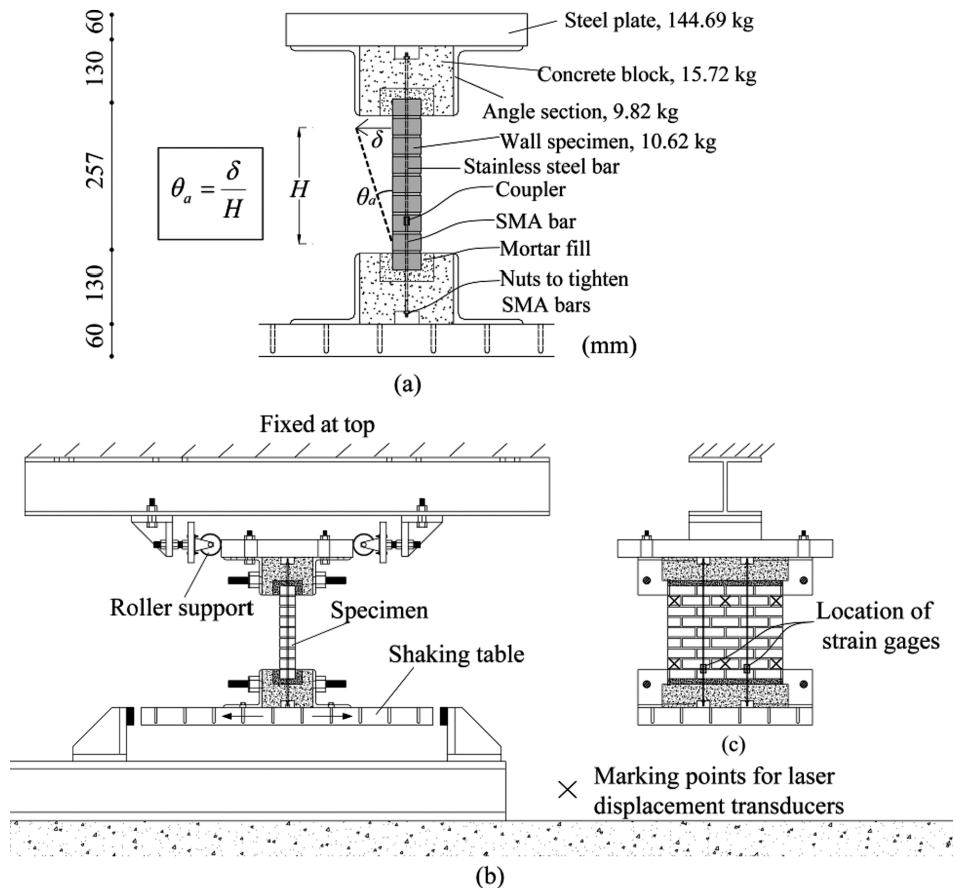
Out-of-plane test set-up on shaking table: (a) specimen with its major components, (b) test set-up and (c) front view showing laser displacement cross-marks
